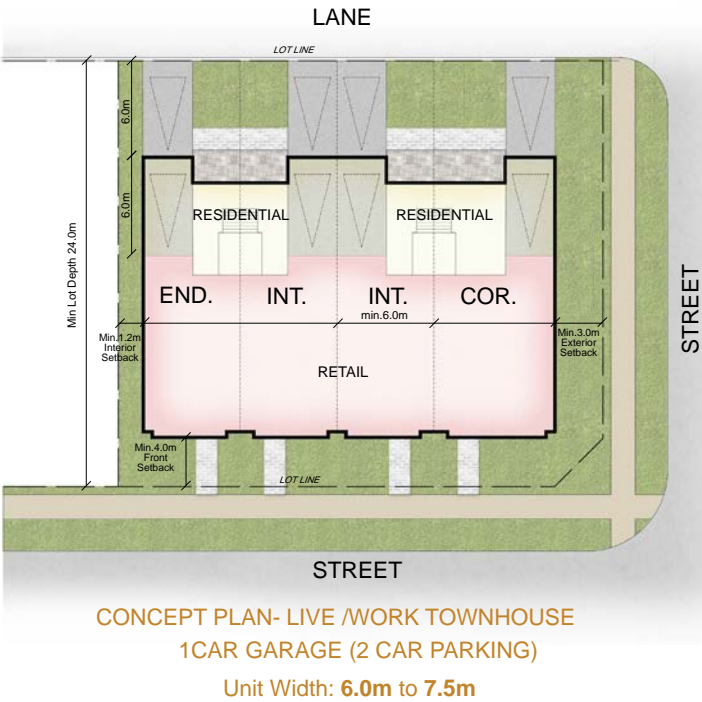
Example of Building Siting for Live-Work Townhouse Typology
